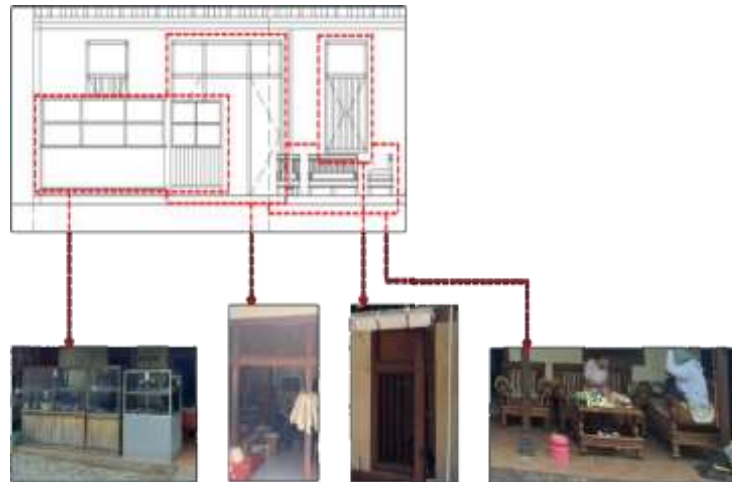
Window and Door Patterns in the Residence of KH Subuki House
